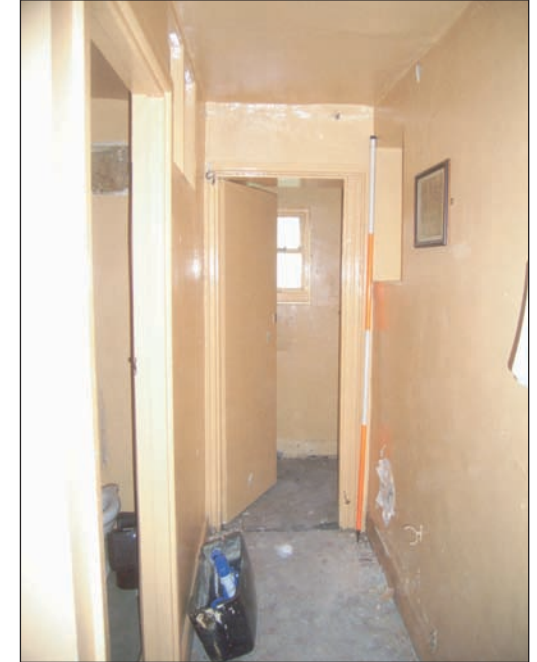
General view of Lavatory on ground floor (original Masons Arms), from the south-east
